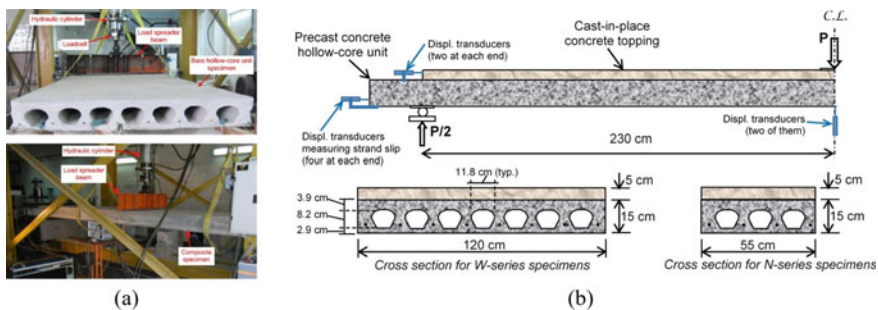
Specimen cross section, instrumentation, and loading setup details adopted by [51]: a On-site photos; b Schematic sketch
